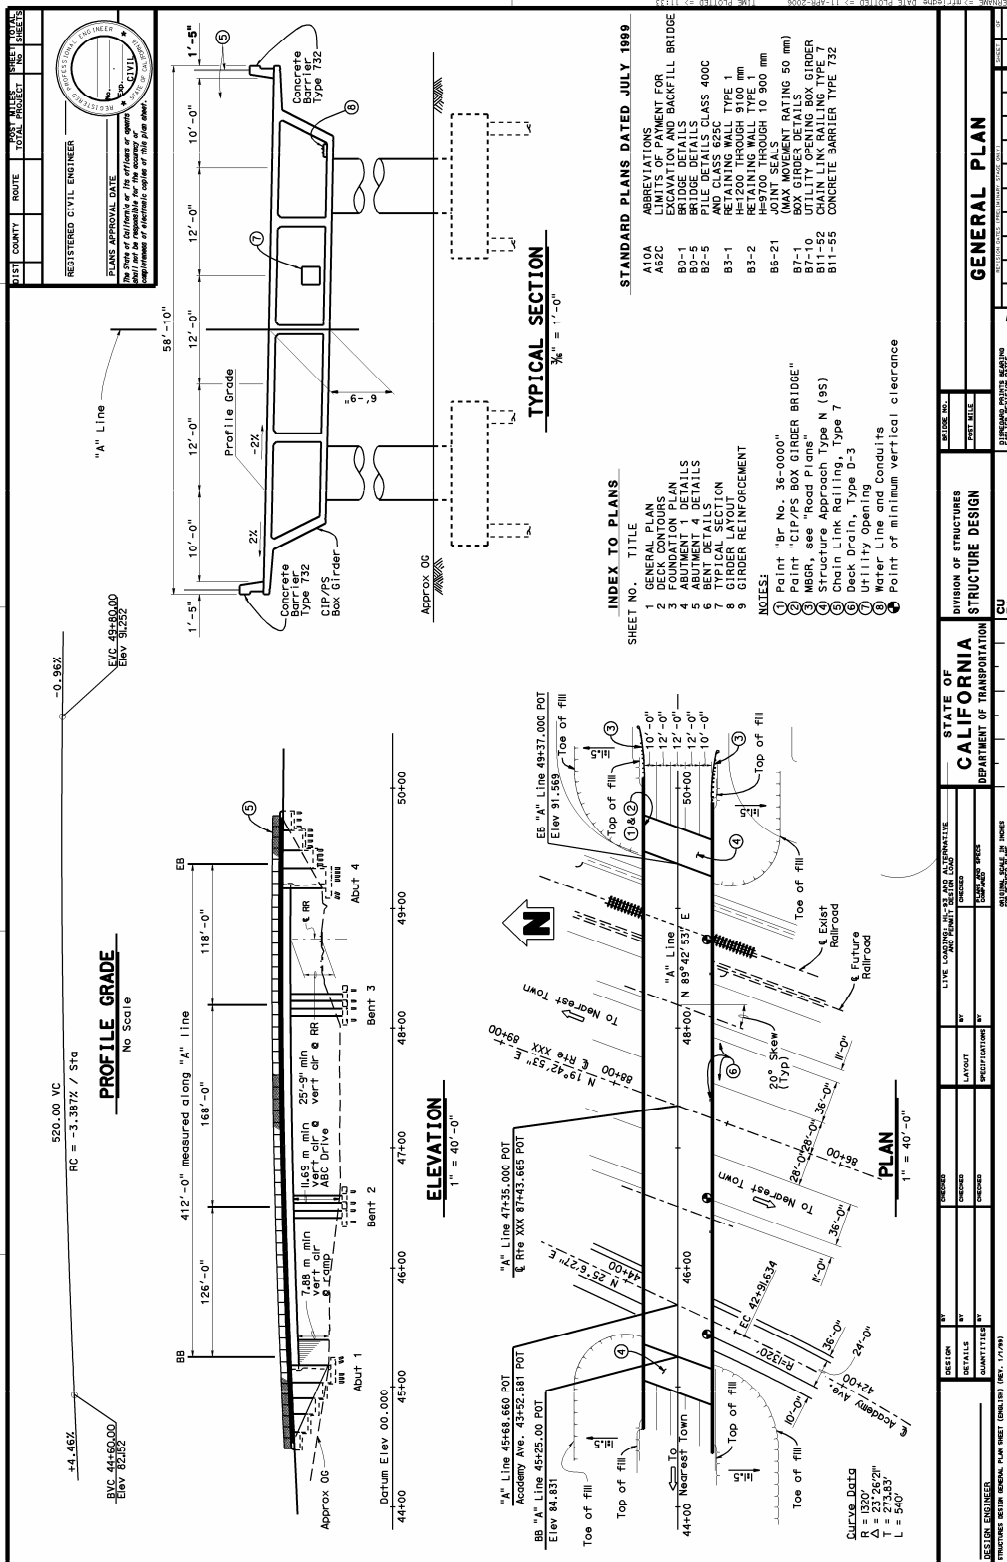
General Plan (Bridge Design Academy Prototype Bridge)
